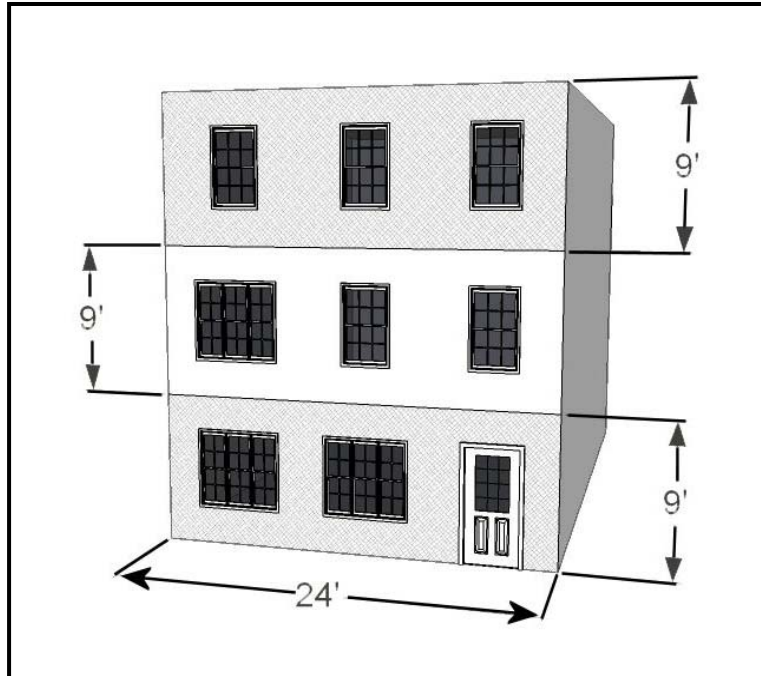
B *Illustration of the window requirement. Each floor has a façade area of 216 square feet and requires 43.2 square feet of windows. The first floor has 66 square feet of windows, meeting the minimum requirement. The second floor has 46.5 square feet of windows, meeting the requirement. The third floor has 36 square feet of windows and DOES NOT meet the requirement.
